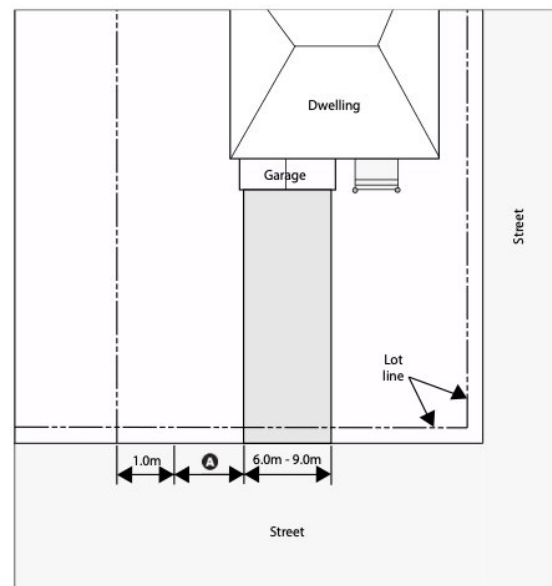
Plan view of driveway setbacks and placement details. (Source: Zoning By-law 2014-014)
